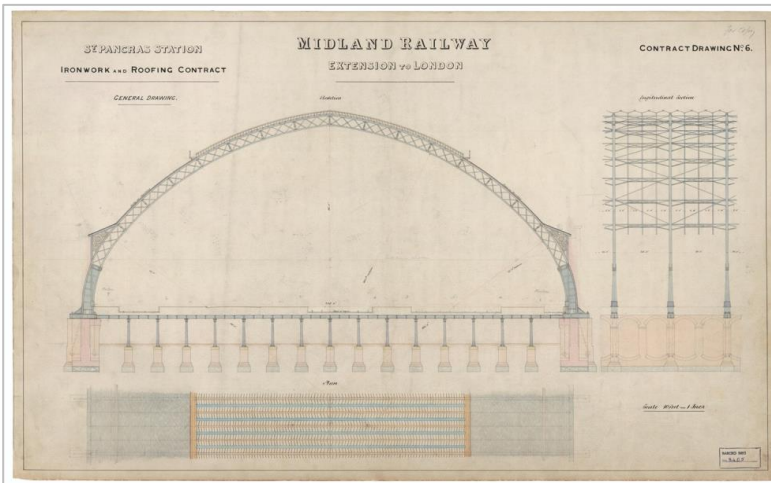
Section drawing of the St. Pancras Train Shed trussed arch roof (Barlow, 1868)
